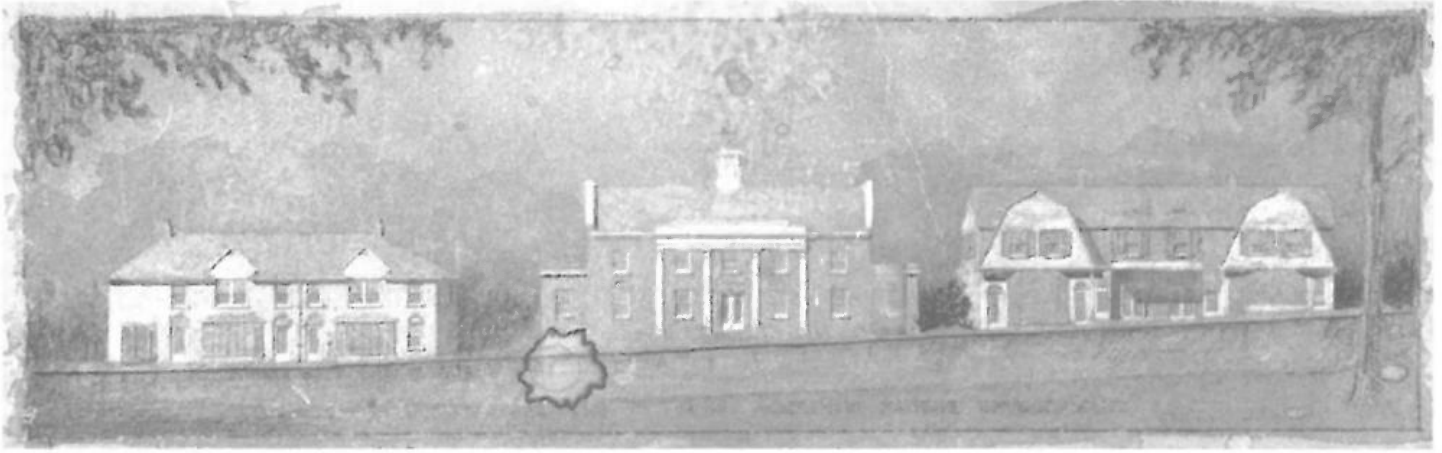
Elevation rendering for Northeast Harbor Redevelopment plan, circa 1928
